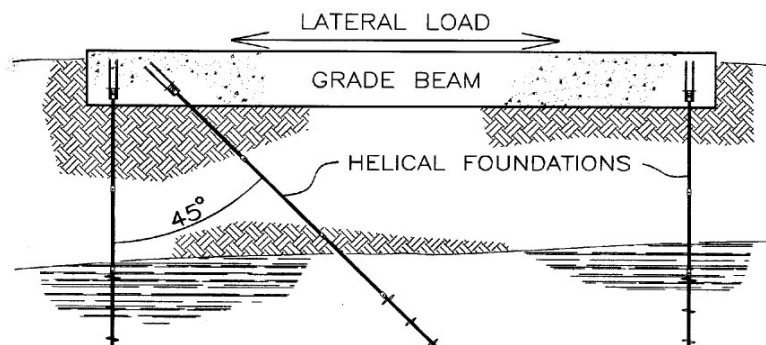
Battered Helical Pile for Lateral Loads for New Foundations
